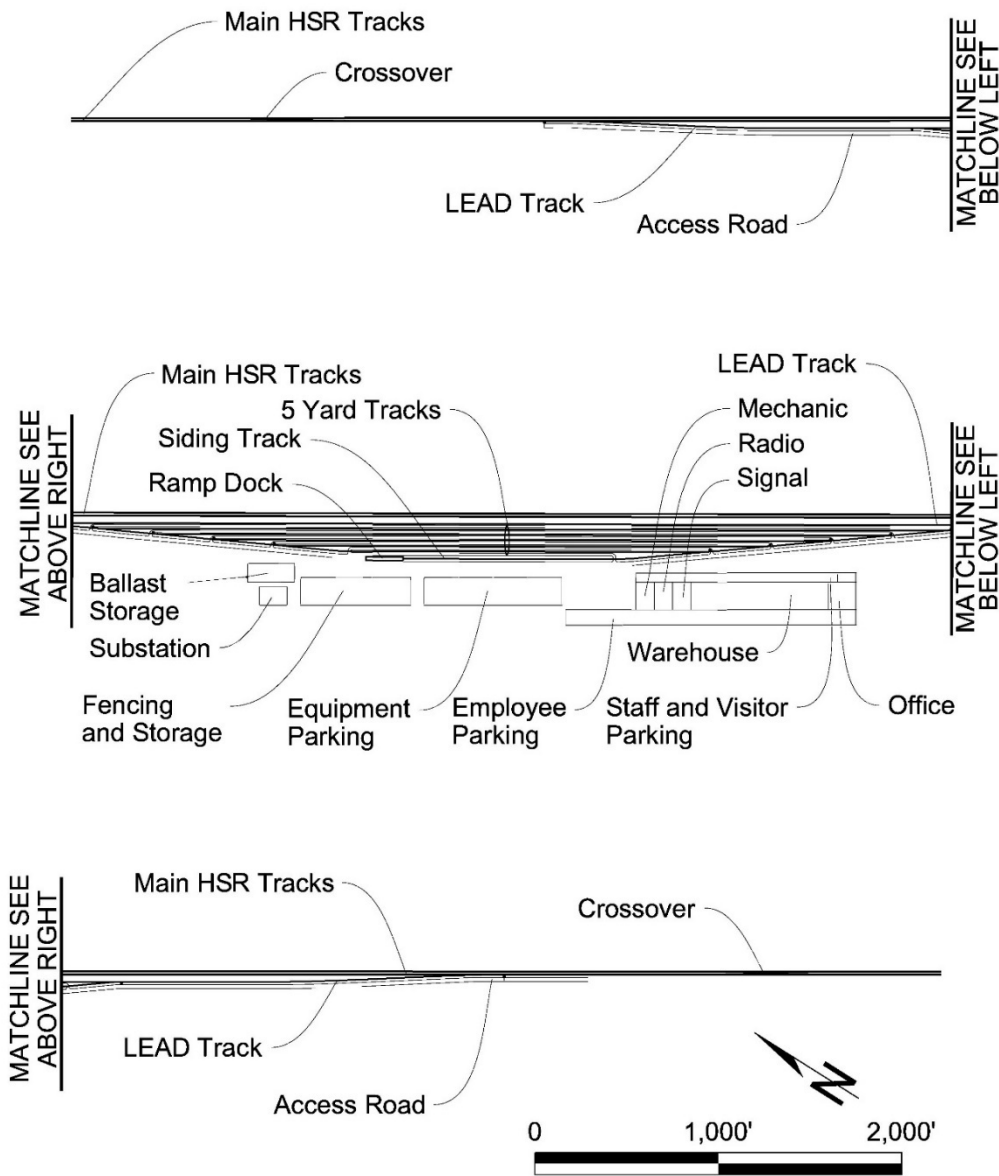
Typical Maintenance-of-Way Facility Layout
